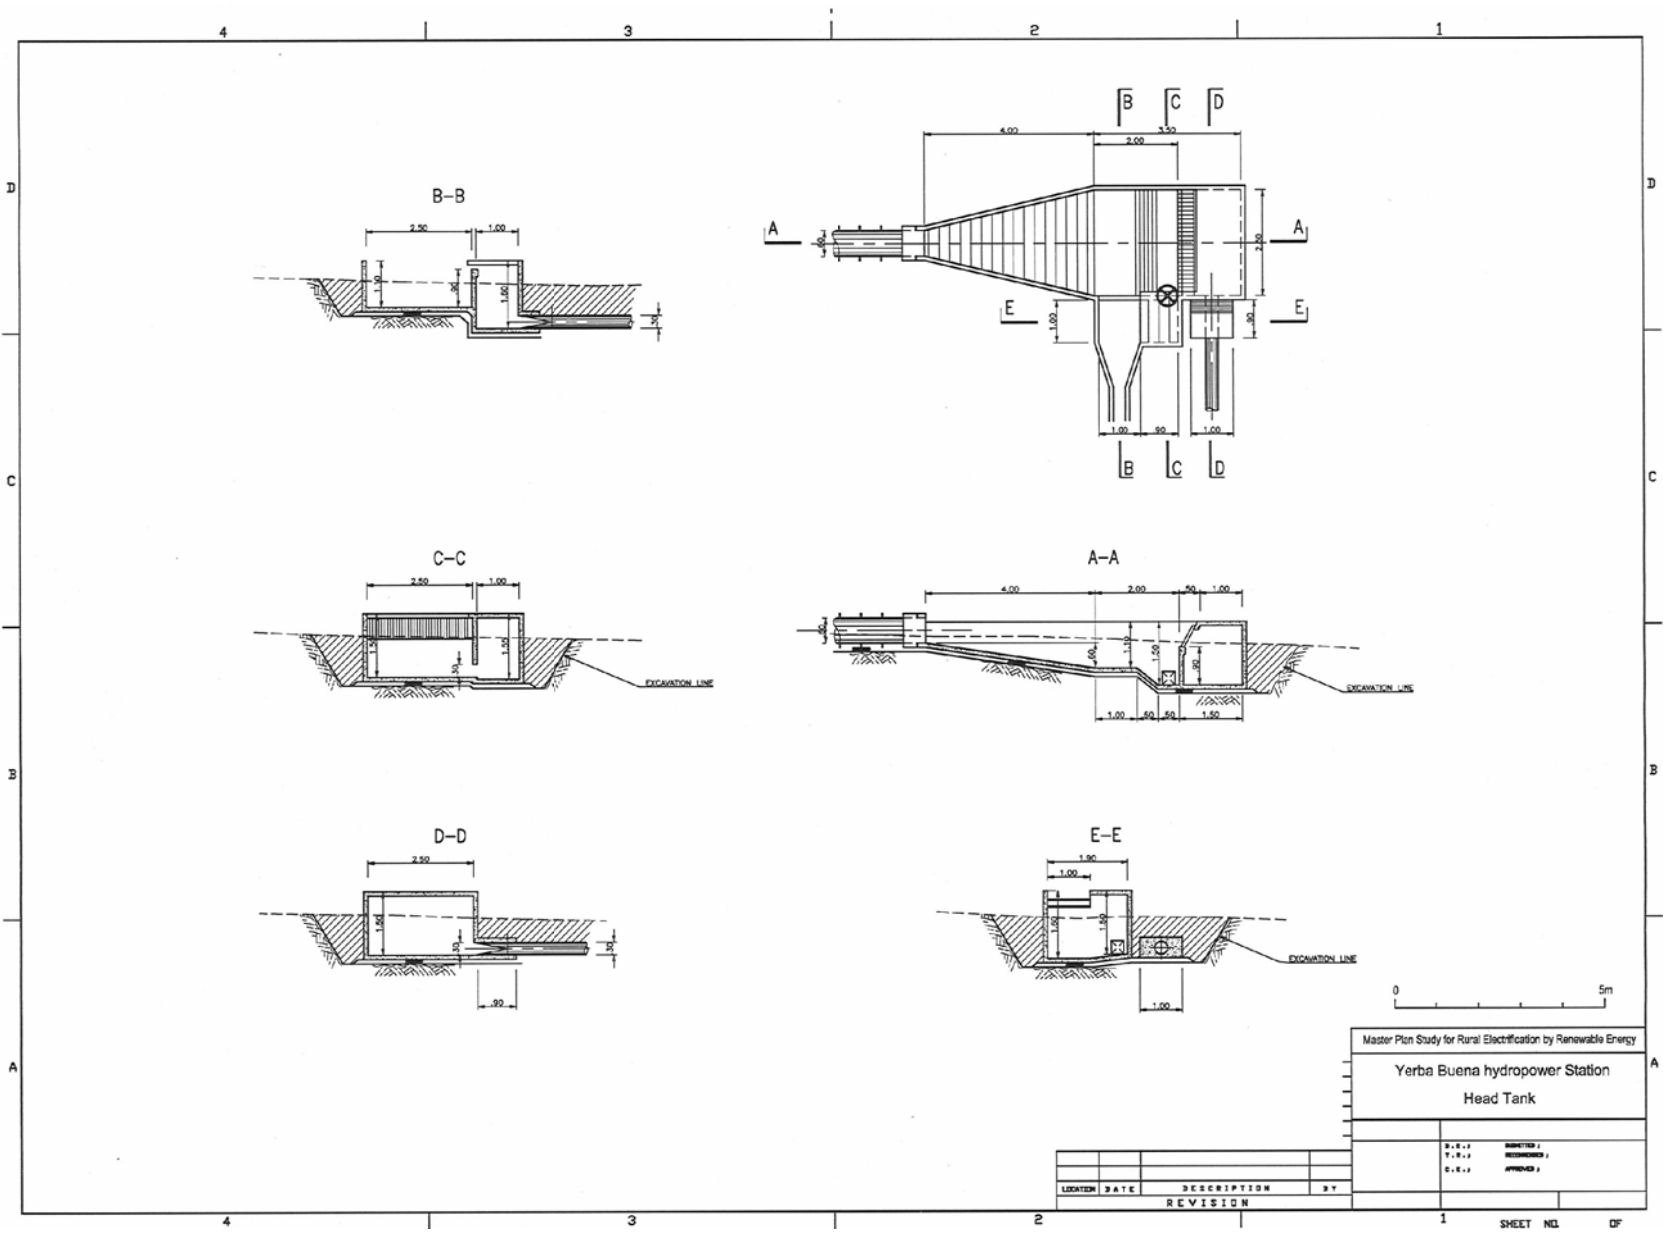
Rough Design Drawings of Head Tank
